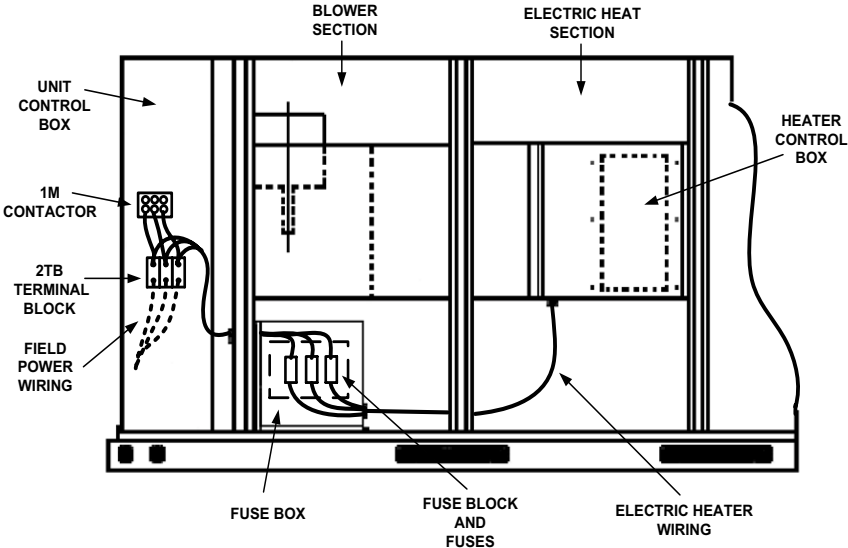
TYPICAL FUSE BLOCK INSTALLATION FOR DCE/DHE/DEE/DHC/DHB 036 THRU 076 PACKAGED COOLING UNITS AND BCH/BCB 036 THRU 060 PACKAGED HEAT PUMPS
